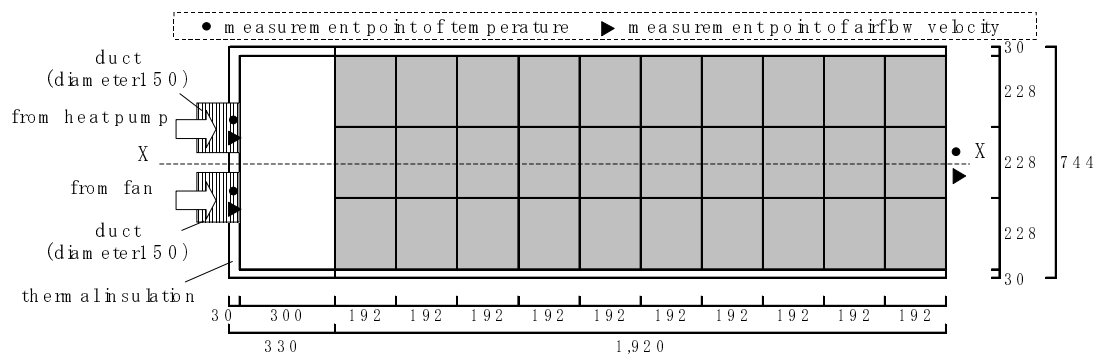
Horizontal cross section of thermal storage equipment. (unit; mm)
